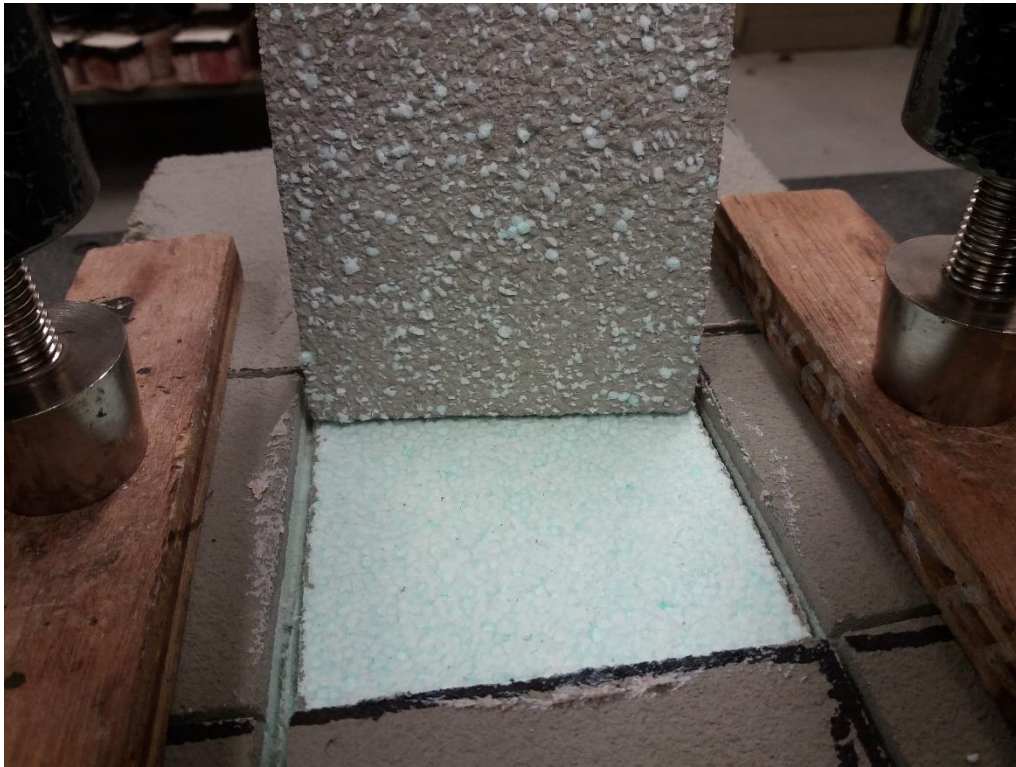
Specimen 1 failure mode between insulation and render.
